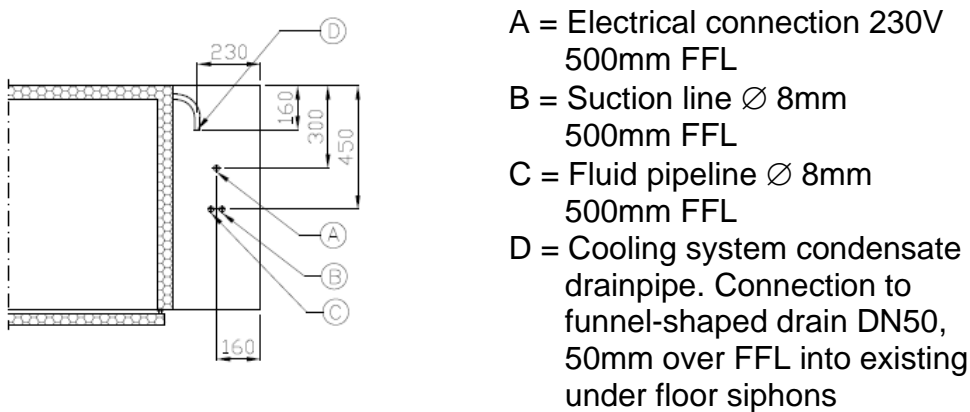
Top view solid waste refrigerator, self-cooling, plug in
